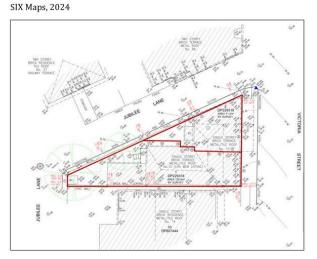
Detail, survey of No. 10 Victoria Street. True North Surveys, 2021
